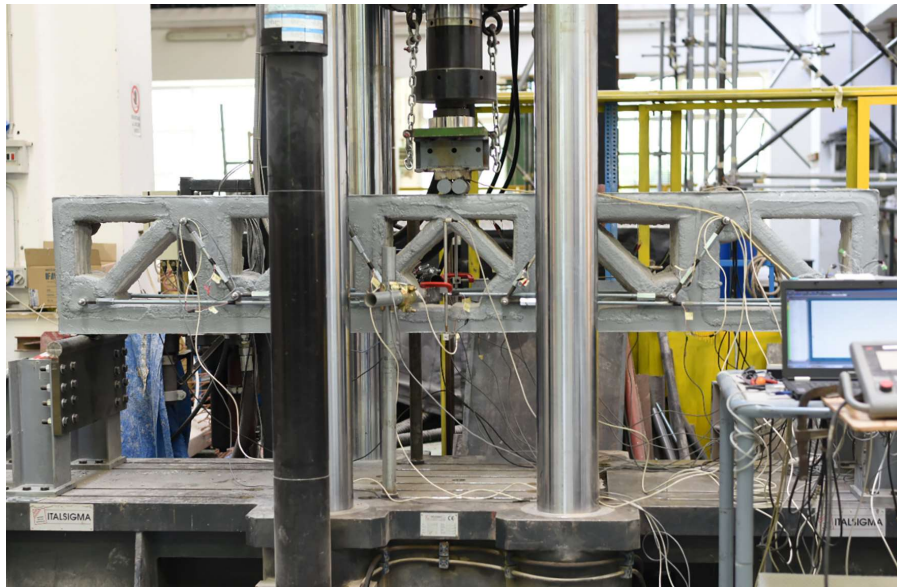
Equipped specimen for the three points bending test (Beam UniNa) [42]
